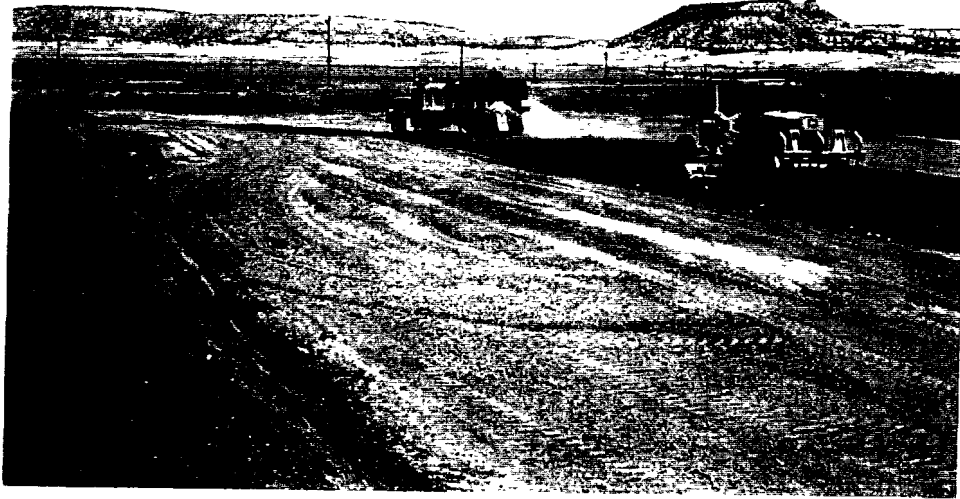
Applying Water and Grading Prior to Clay Liner Construction
